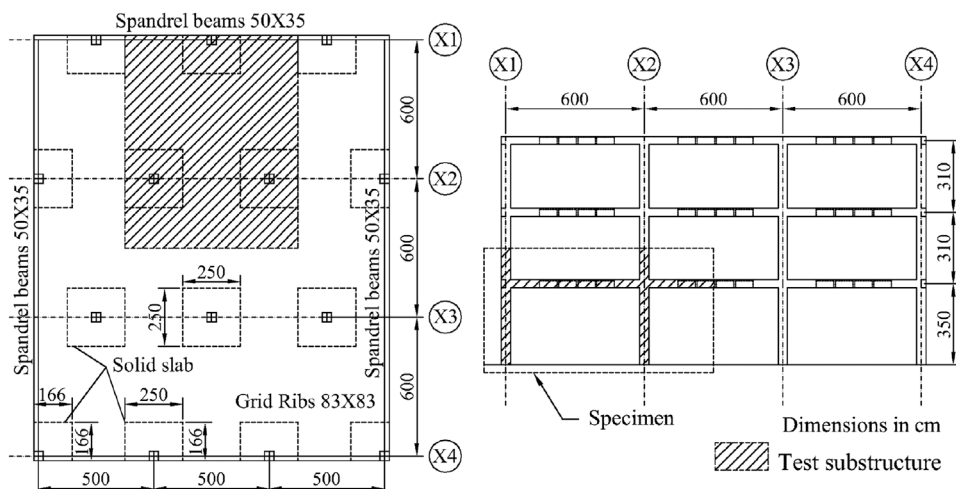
| Prototype structure: plan (left); elevation (right). Units in centimeters.
